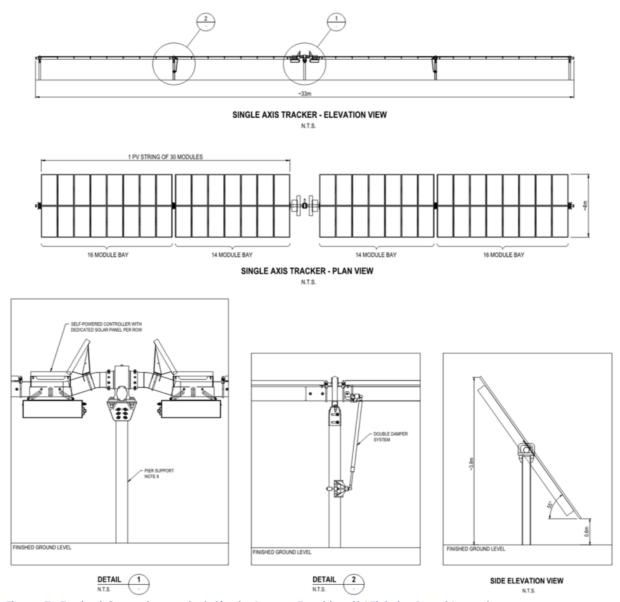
Typical Ground-mounted, Single Access Tracking (SAT) Solar Panel Layout
